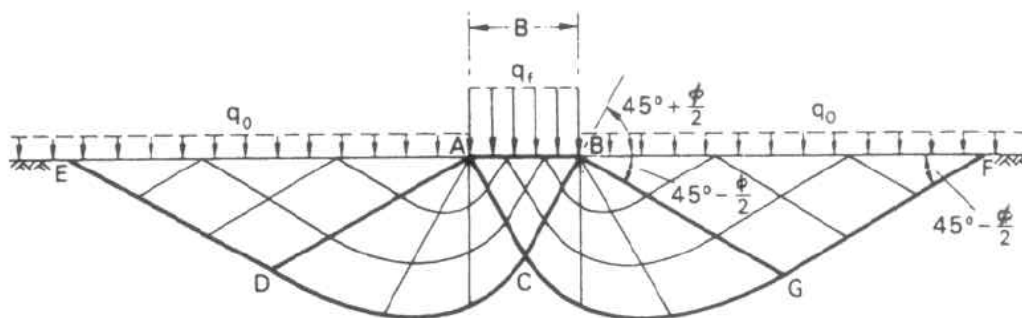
Failure Mode under a Strip Footing
